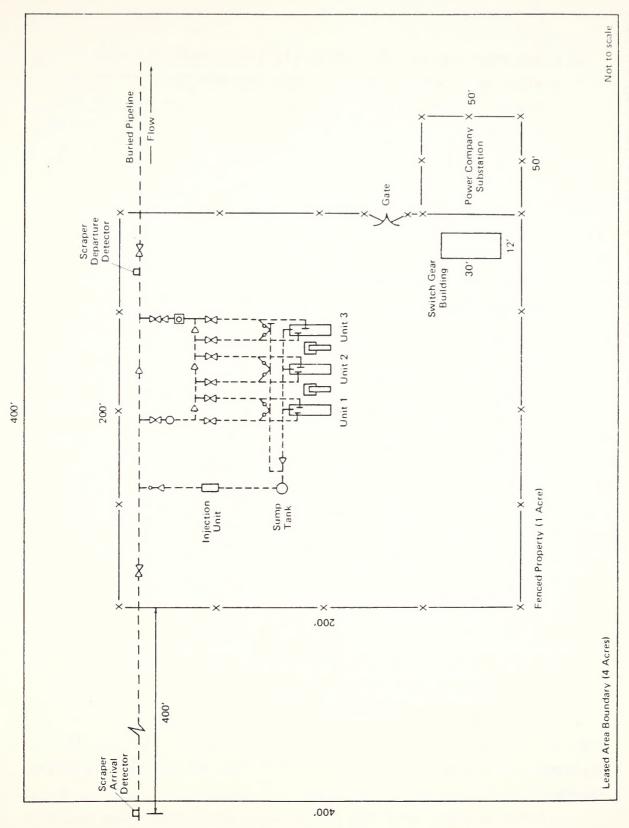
TYPICAL INTERMEDIATE PUMP STATION
